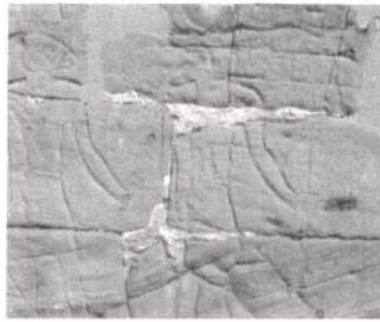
Deteriorated mortar in relief sandstone wall blocks.
